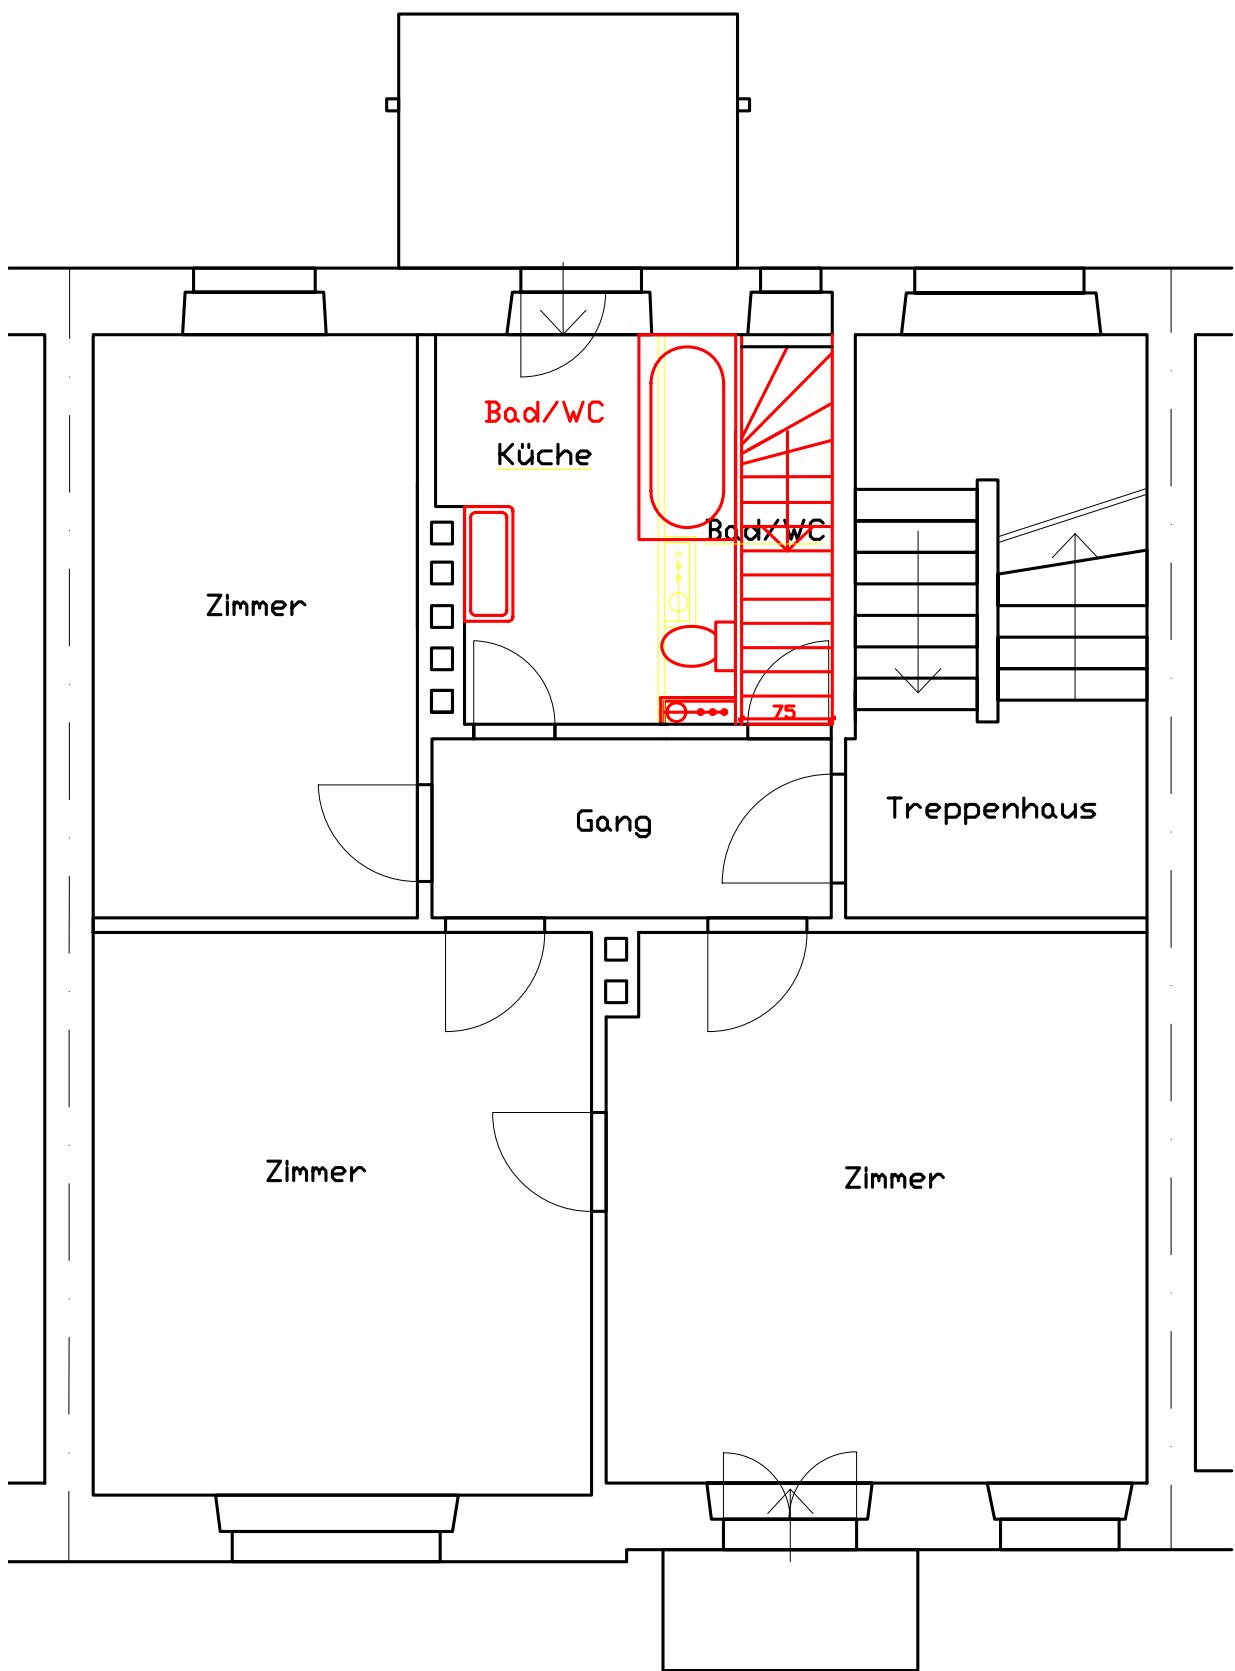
Floor plan of residential building (Hongger) 1st – 4th floor
